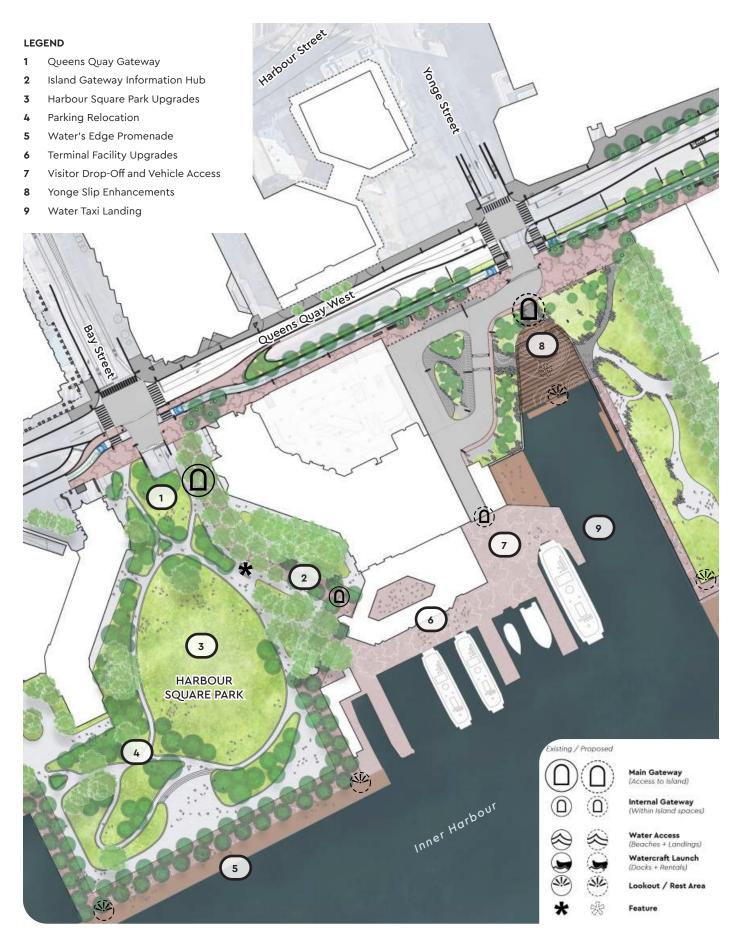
Jack Layton Ferry Terminal Focus Area Plan
